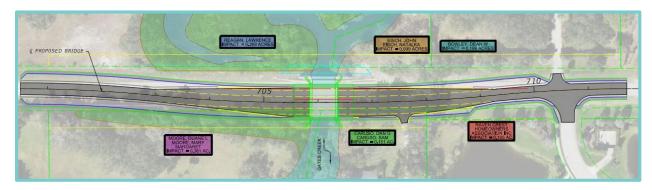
Upper Manatee River Road Temporary Bridge
